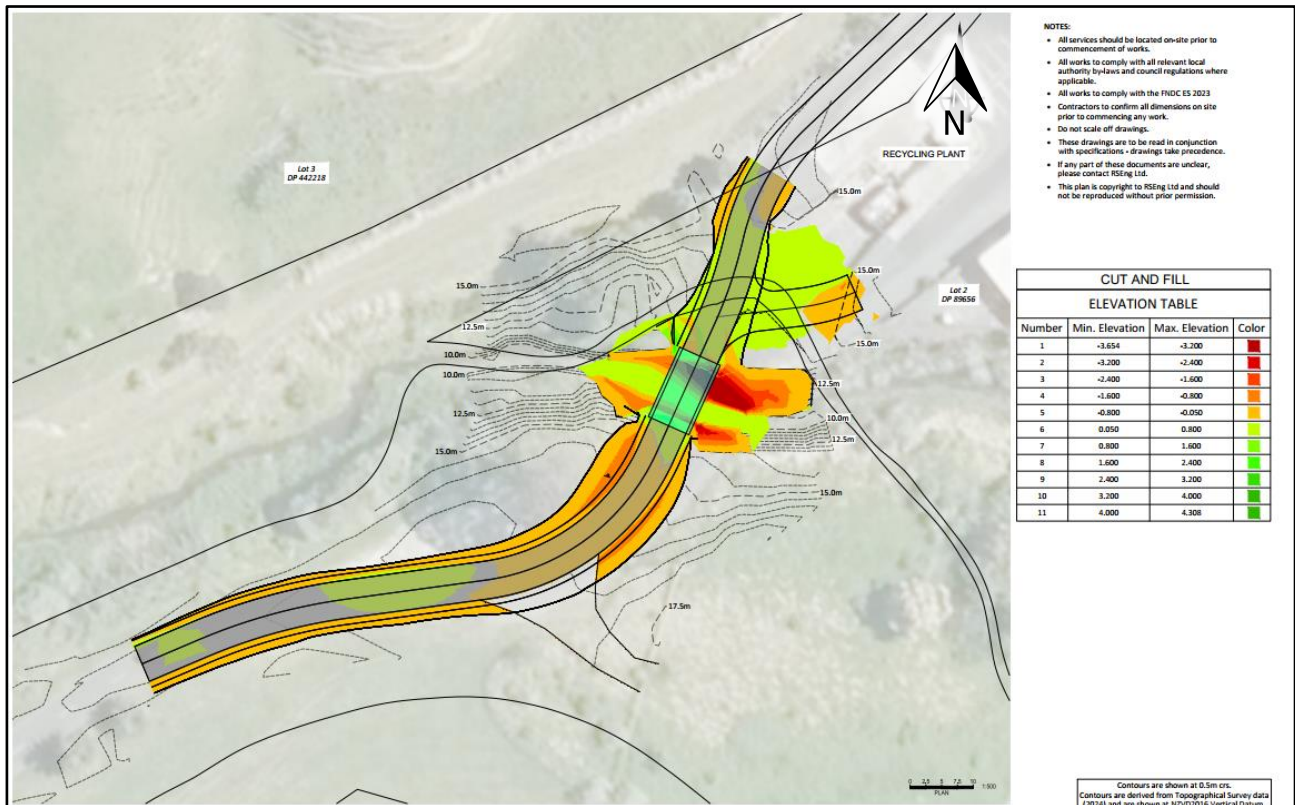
Proposed Bridge Earthwork Plan (Source: RS Eng Limited, 23 April 2025)
